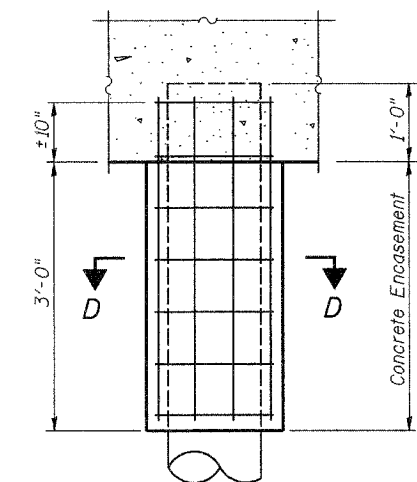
DETAIL OF PROTECTION FOR METAL SHELLS AT PIERS
